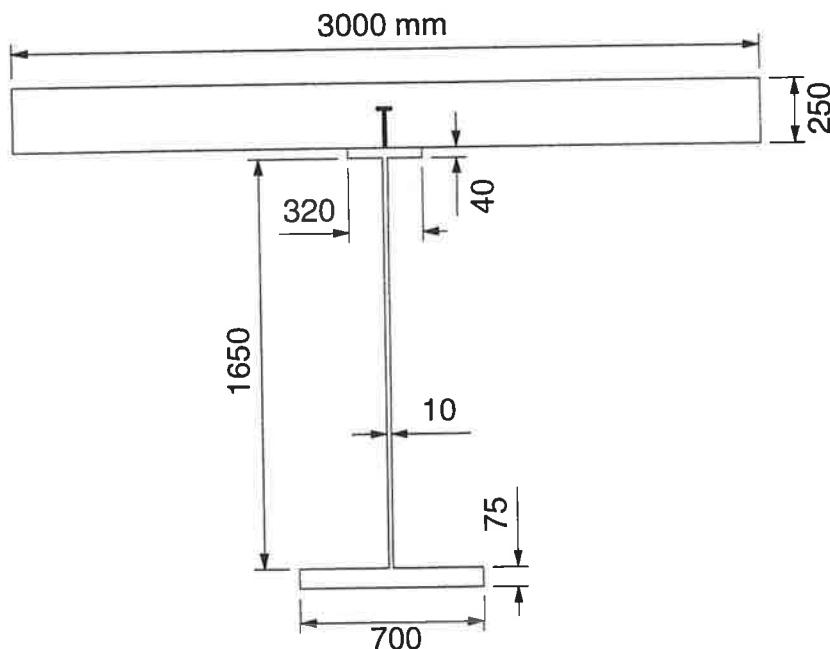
Cross-section of 50.4 m long simply supported composite beam.
